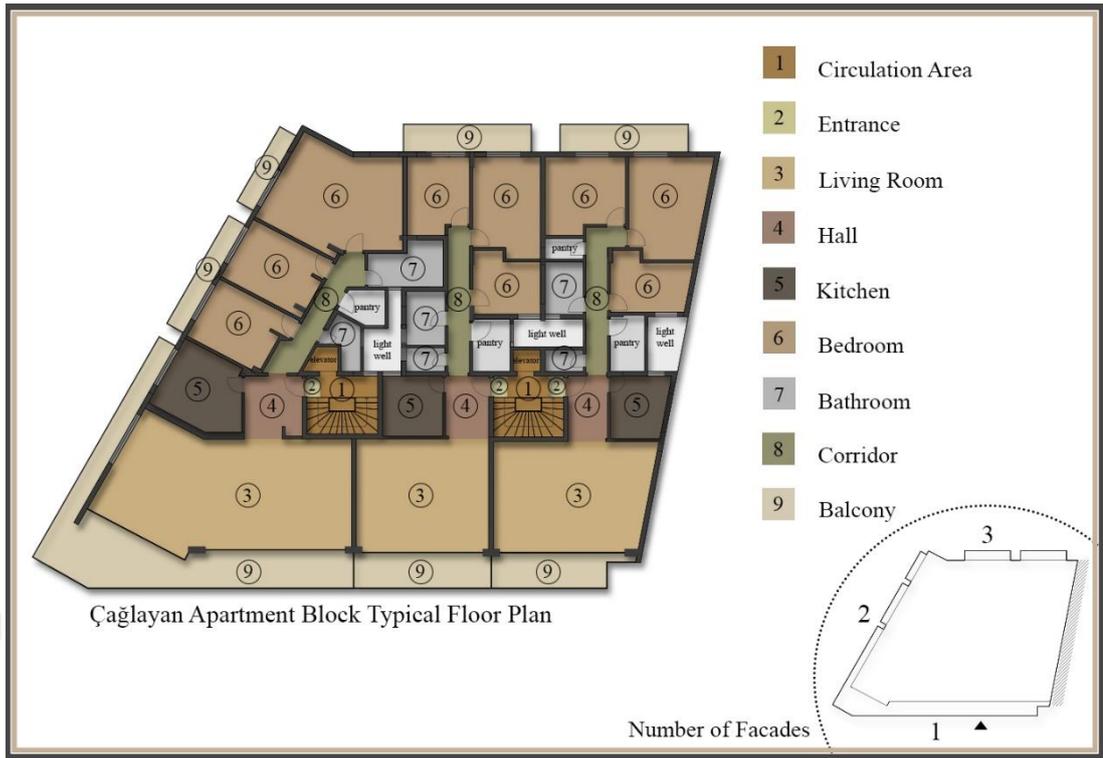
Çağlayan Apartment Block floor plan and functions. Drawn and produced by the author.
